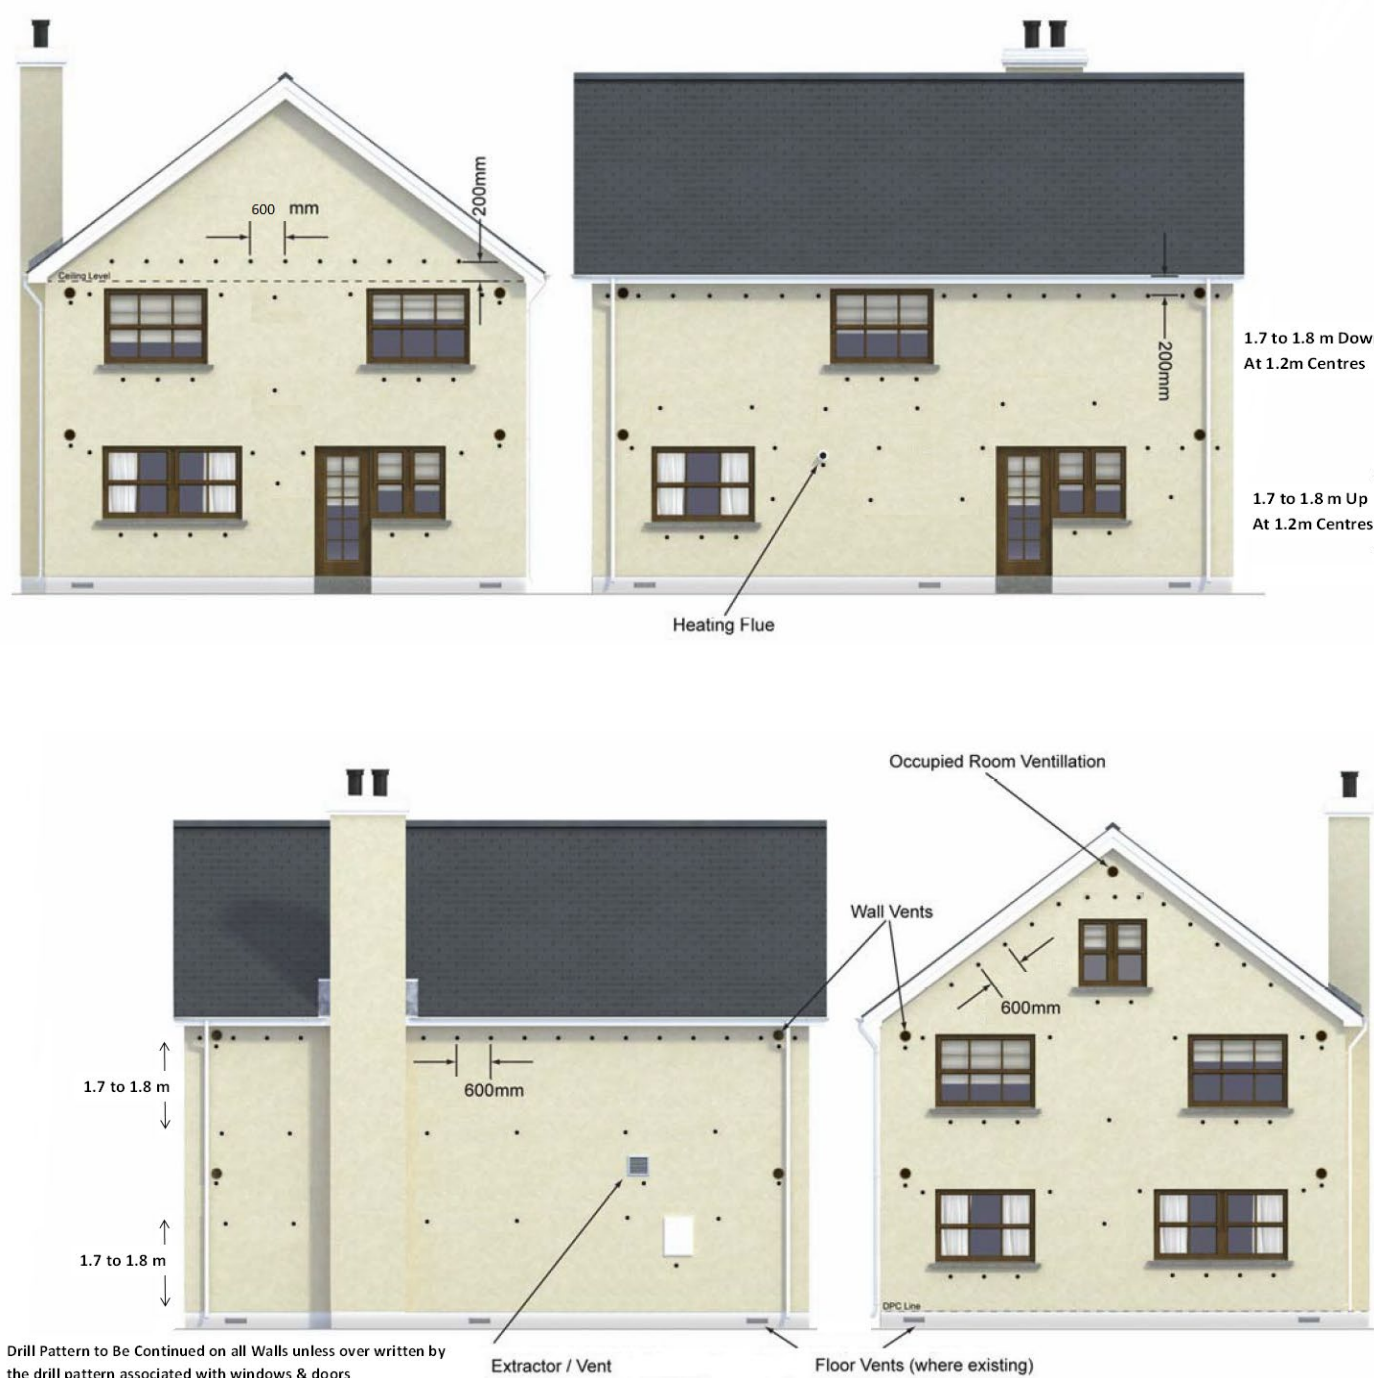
Typical Kingspan EcoBead Hole Drilling Pattern in a Detached Dwelling for Residual Fill Application - New and existing buildings with existing partial fill insulation in cavity
